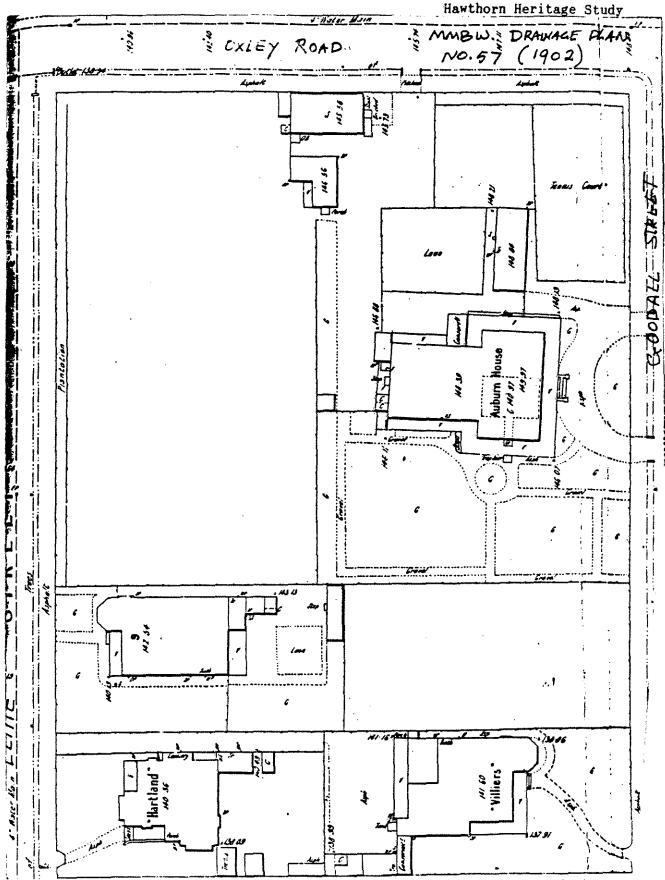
Villas in garden settings: A turn of the century MMBW drainage plan showing the garden lay-out of "Auburn House" at 4 Goodall Street, Hawthorn.
